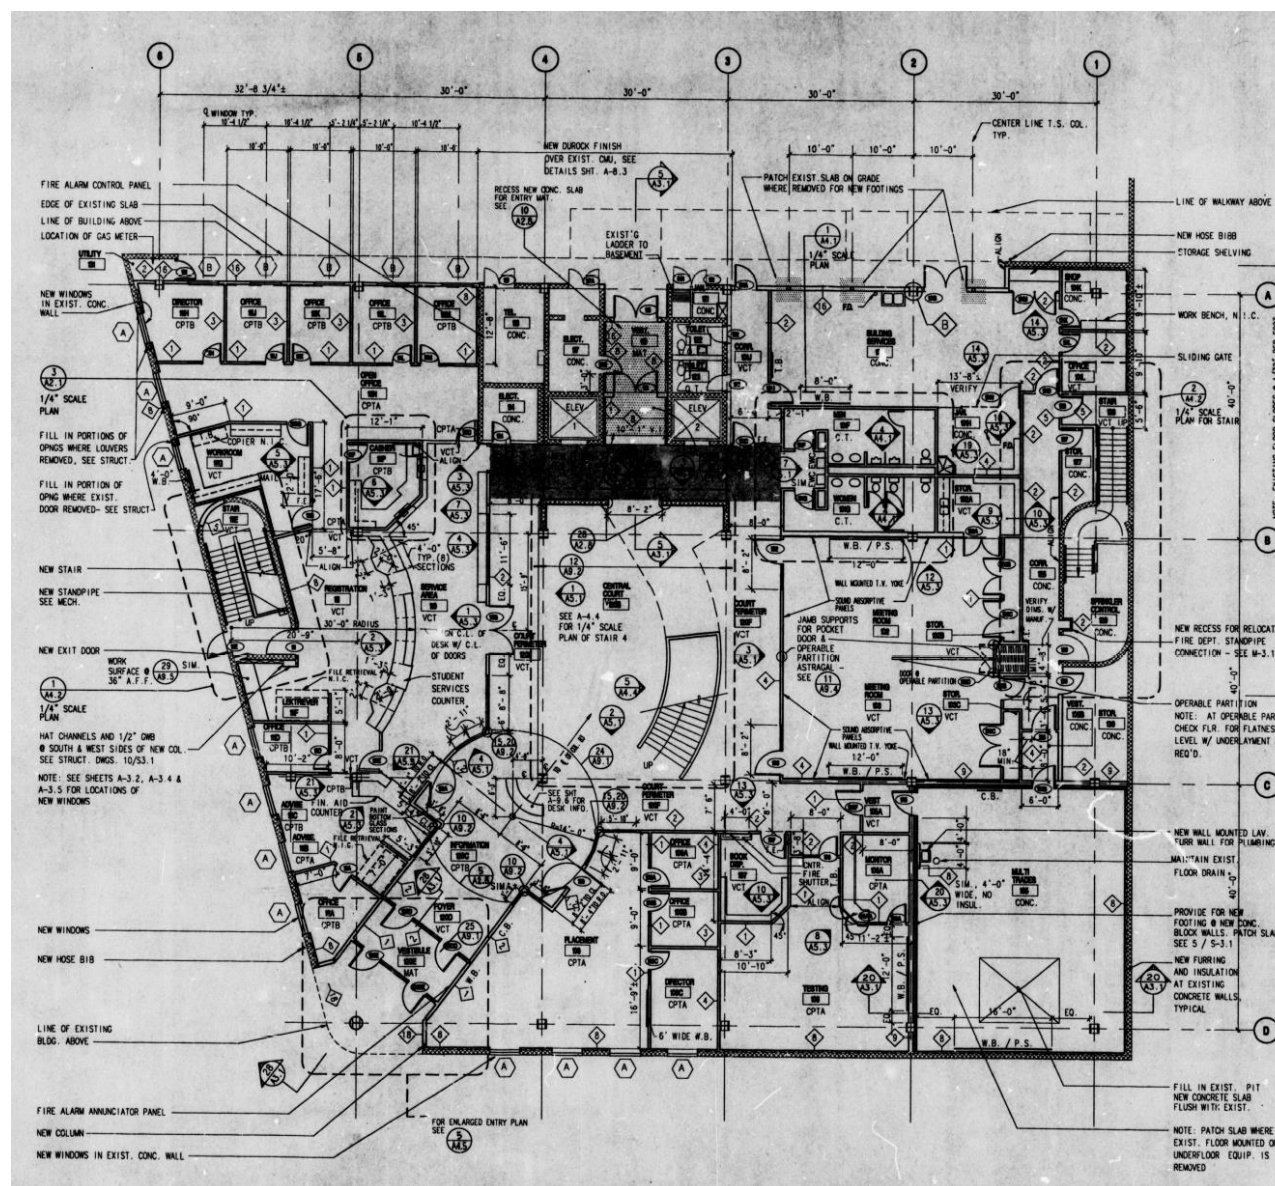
First Floor Plan - 1996 Renovation, Johnson Architecture & Planning, 1995
